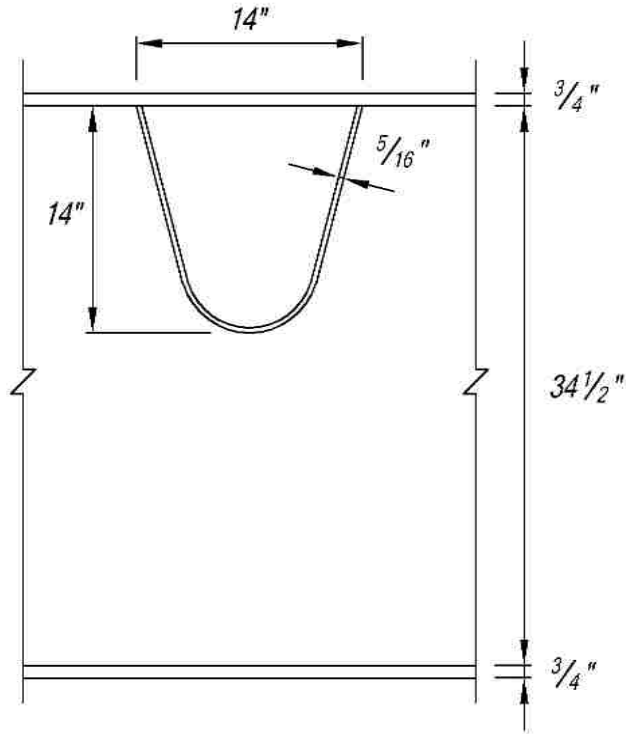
Dimensions of the rib-to-floor beam connection of SOBD for unnamed lift bridge
